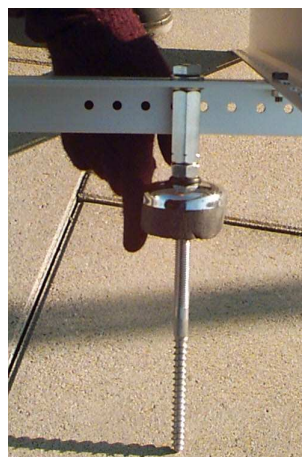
Mountings for a angular roof, on the roof; special screw installation
